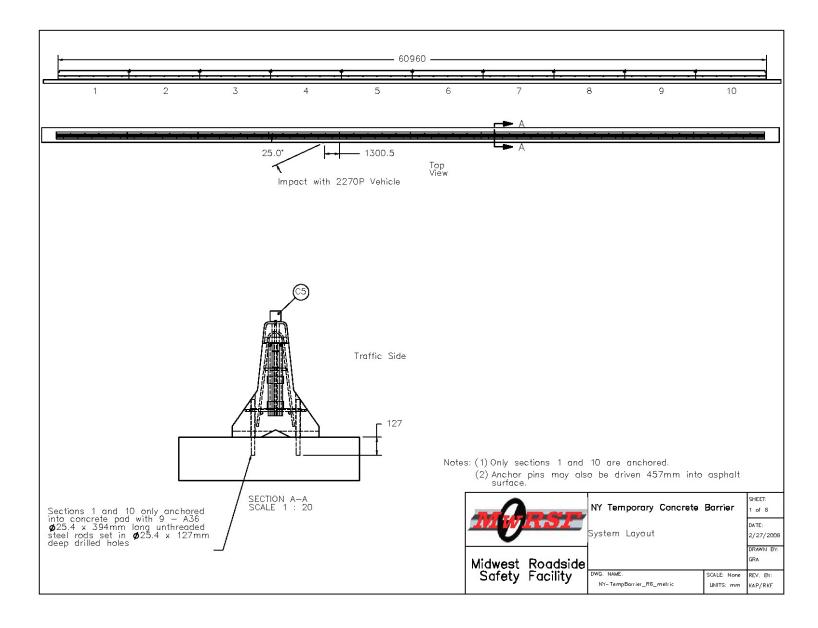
Unstiffened Temporary Concrete Barrier System Layout, Test NYTCB-2
